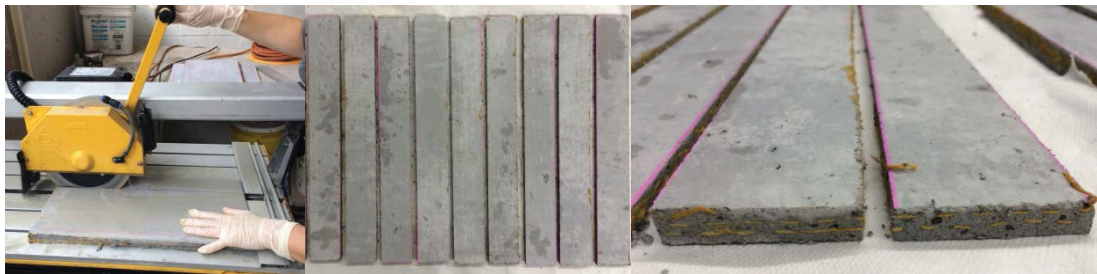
FRCM Coupon Saw Cutting (left), Cut Coupons (Middle and Right)
